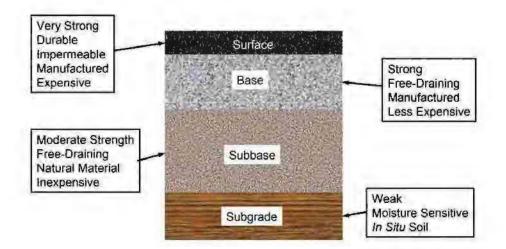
Typical design of a road and substructure as per FHWA-NHI-05-037
